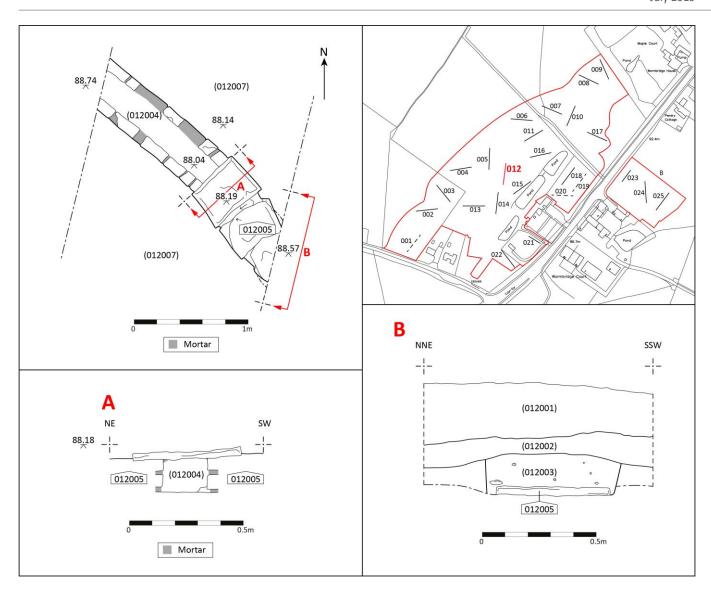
Composite plan showing location of culvert (012005) and details of construction
